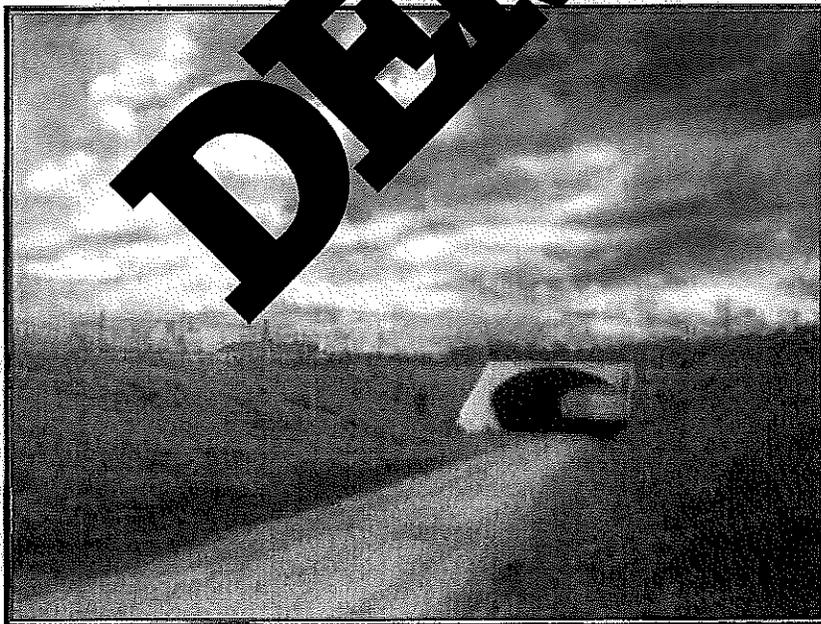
View looking north along Tonner Canyon Road, as Tonner Canyon passes under Grand Avenue.
